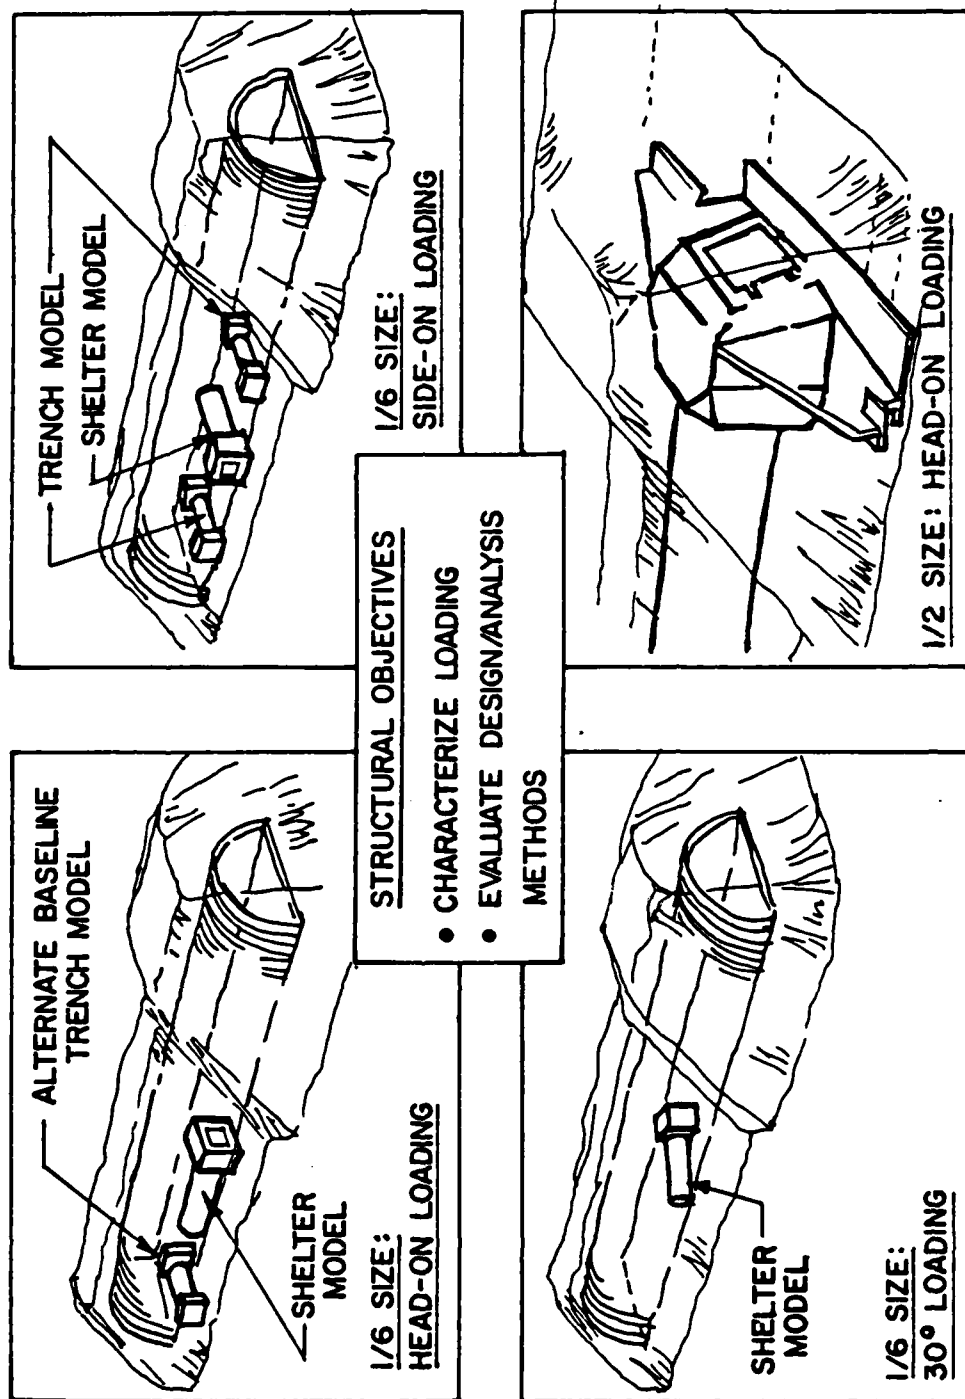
LARGE SIZE HORIZONTAL SHELTER TESTS
